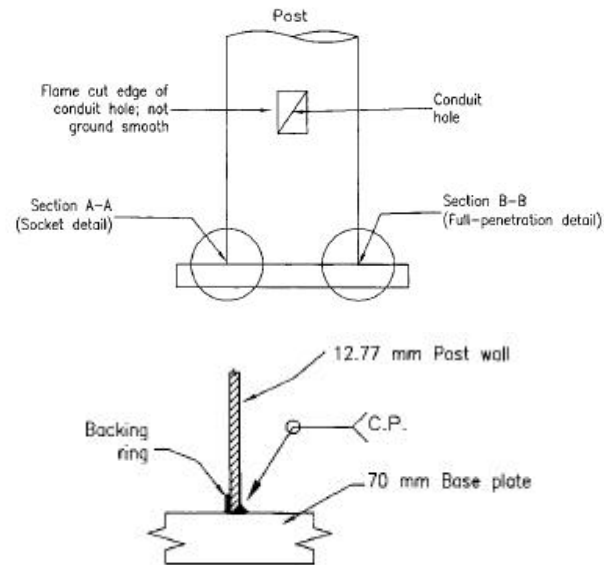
CJP welded pole-to-base plate detail (Gilani and Whittaker, 2000b)
